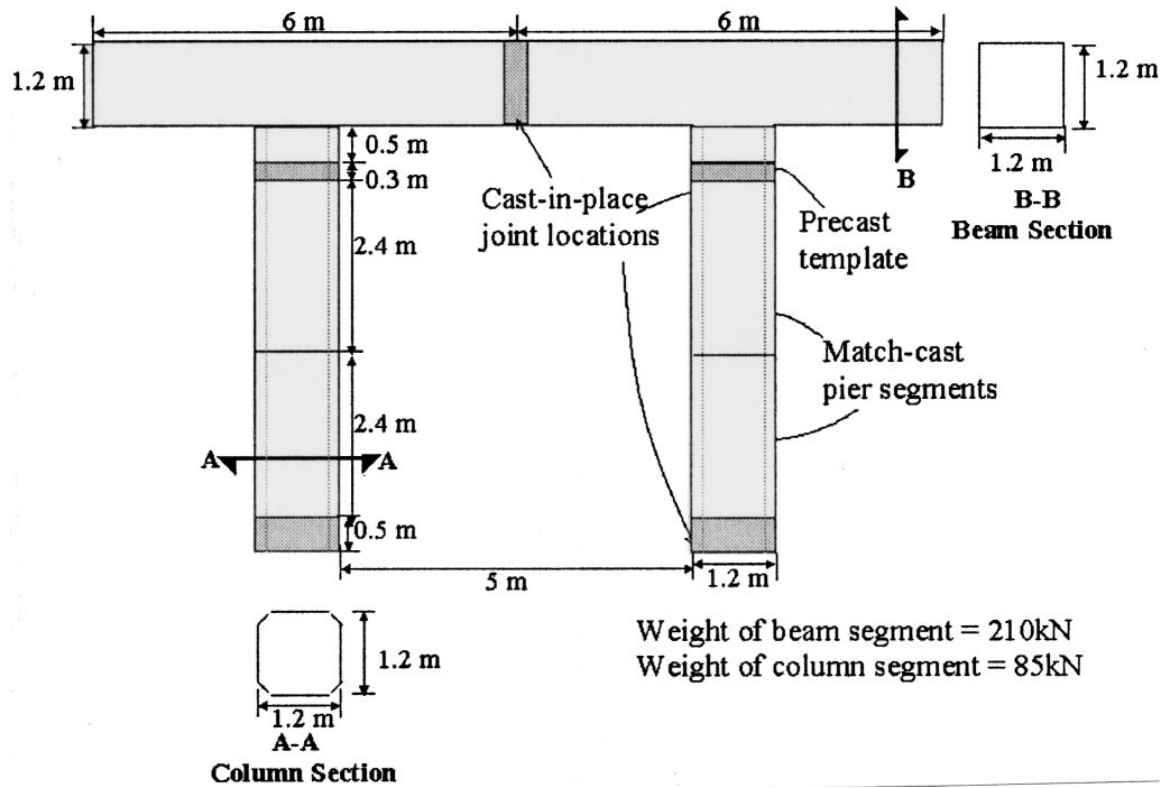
Segmentally Precast, Post-Tensioned Bridge Pier System [Kwan and Billington, 2003]
